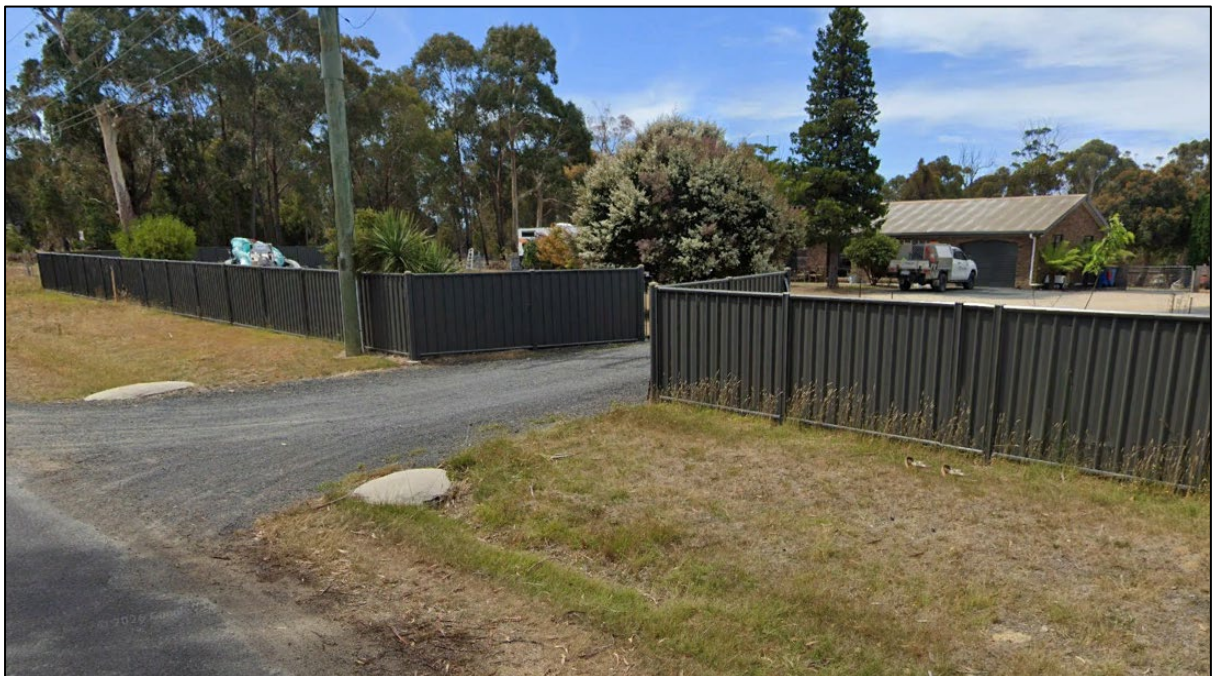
Image of existing single dwelling upon subject land, looking northeast from Riverview Road (Source: Google Earth).
